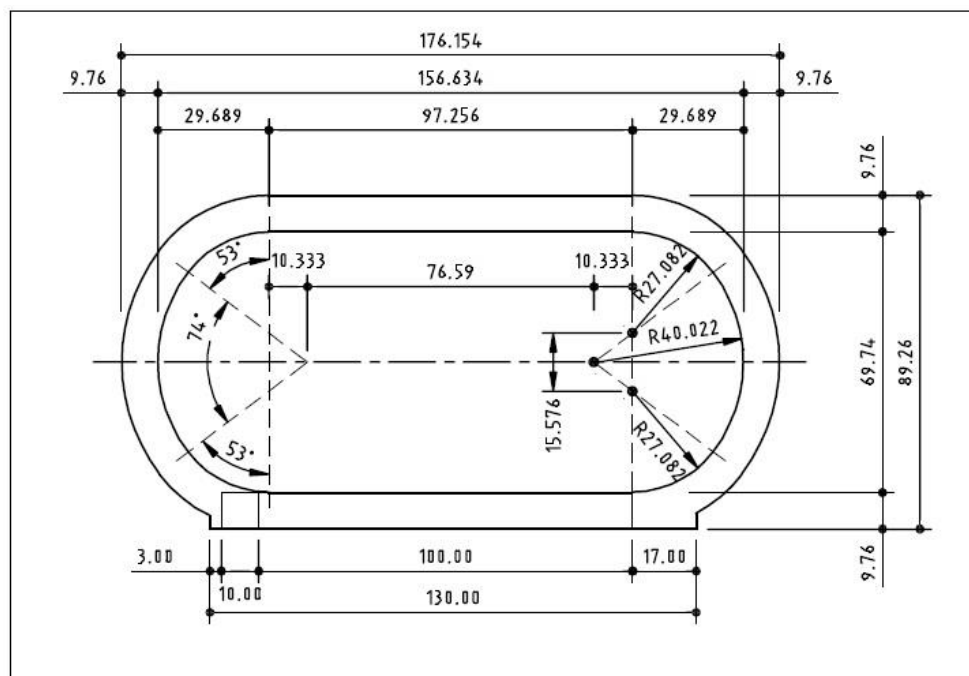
Shape and dimensions of 400m Double Bend Track (Radii 40.022m and 27.082m)
